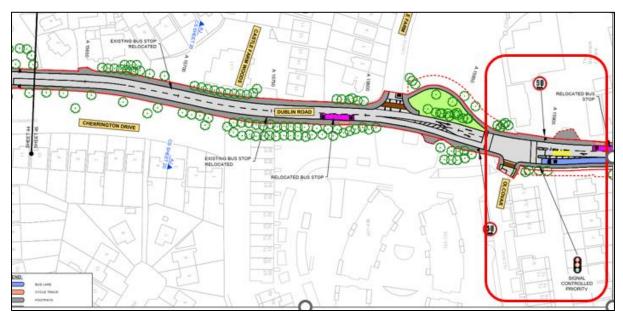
Extract from General Arrangement Drawing at Dublin Road/ Olcovar junction SCP Northbound (Sheet 45)
